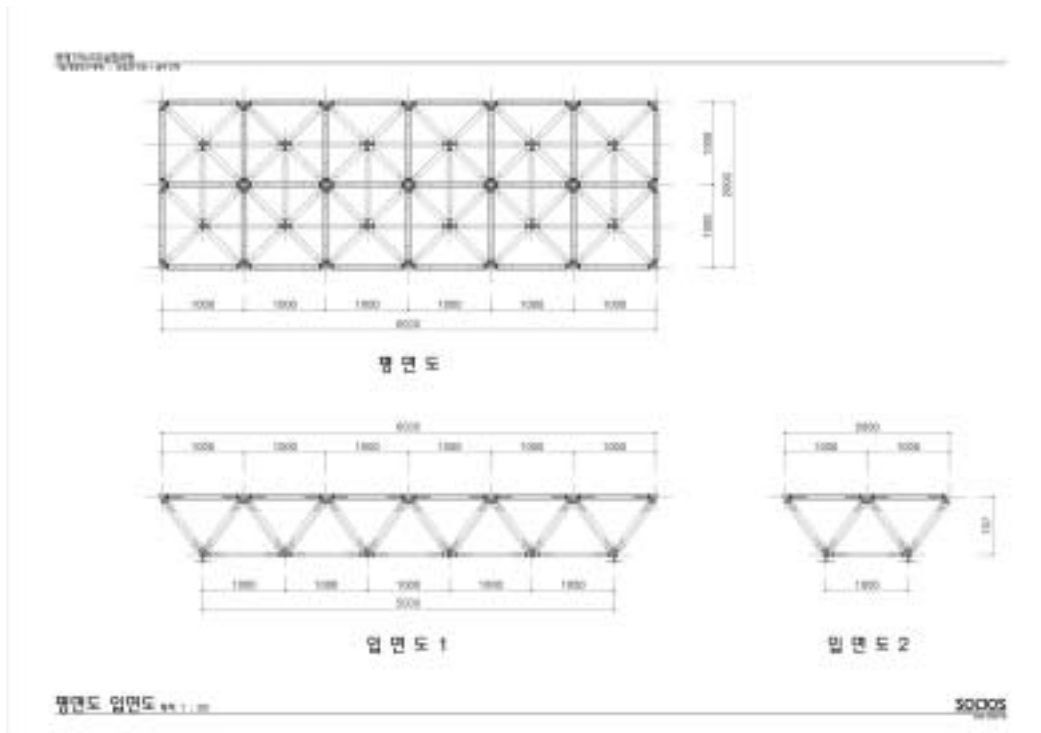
Plan of full-scale test specimen for wood space truss
